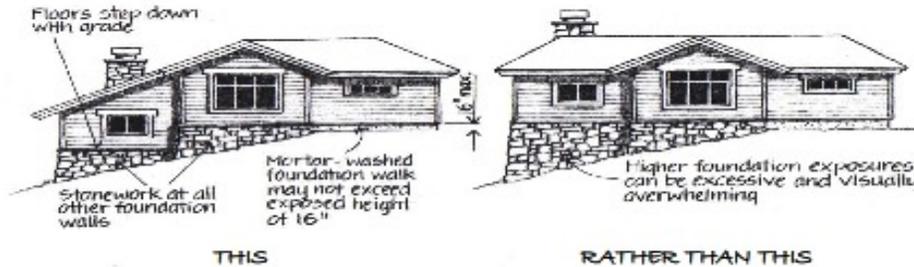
ILLUSTRATION OF STEPPED FOUNDATION WALLS
